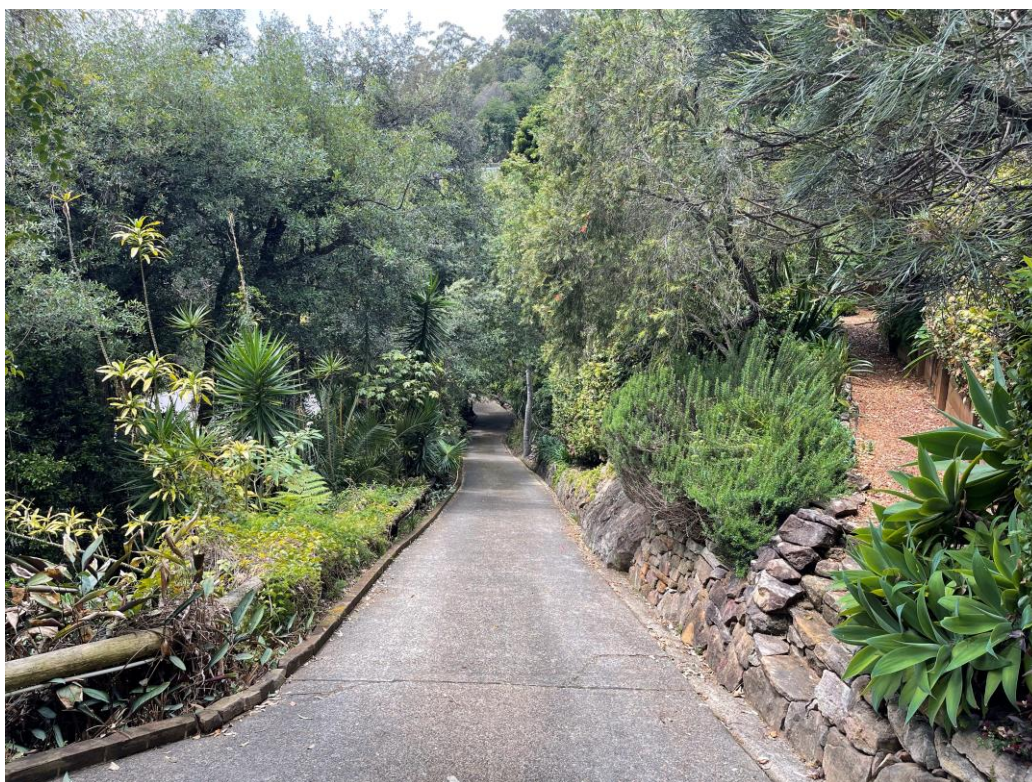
View of common entry driveway to the site, looking down towards the south-east
